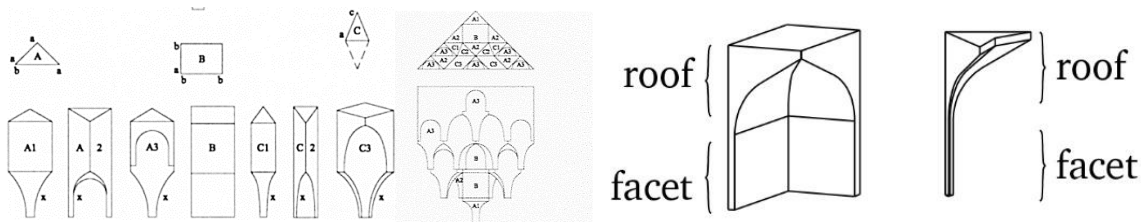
Simple elements of muqarnas (roof and facet), Plans, Elevations, Sections, and Details of the Alhambra. [5]
